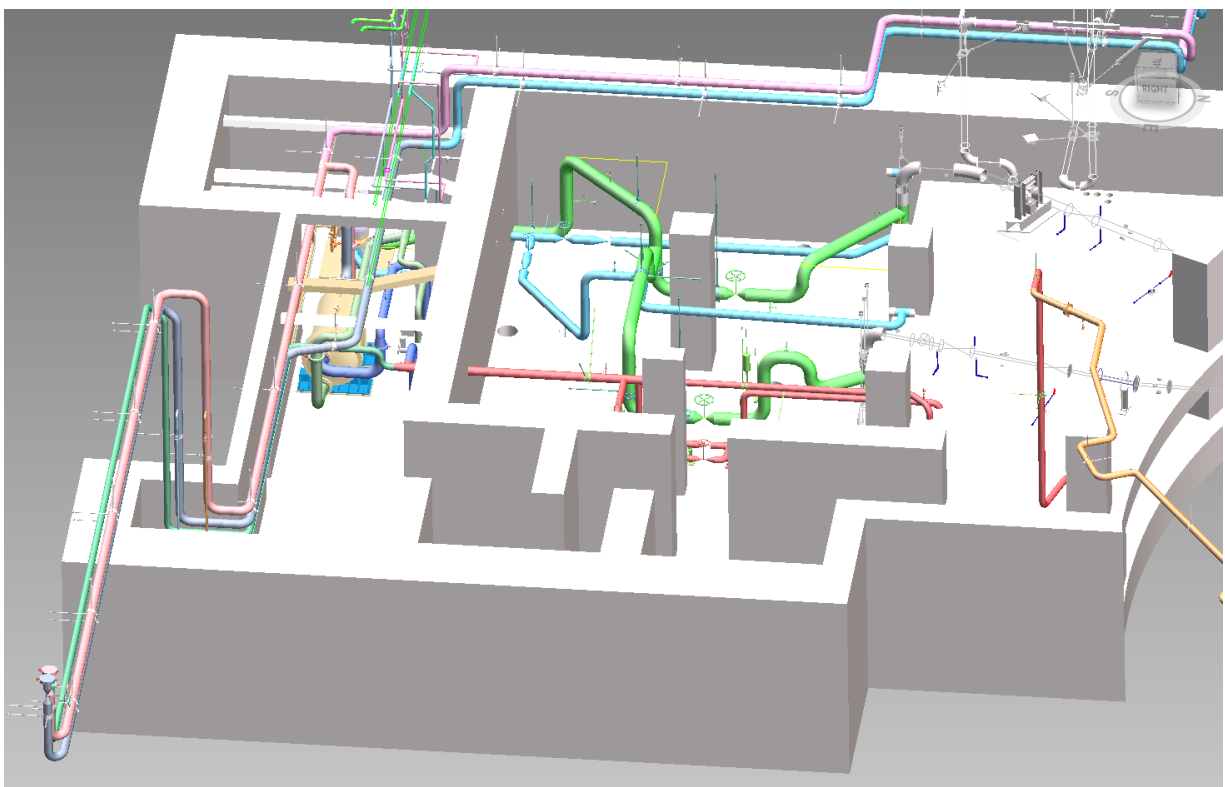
Ground plan of the AB el. 89, showing new piping and major equipment (PMP, HEX) – look from plant east side
